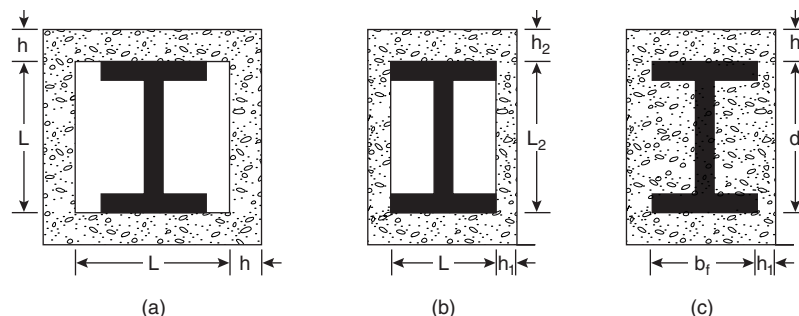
Concrete-protected structural steel columns. (a) Square shape protection with a uniform thickness of concrete cover on all sides; (b) Rectangular shape with varying thickness of concrete cover; and (c) Encasement having all re-entrant spaces filled with concrete.
